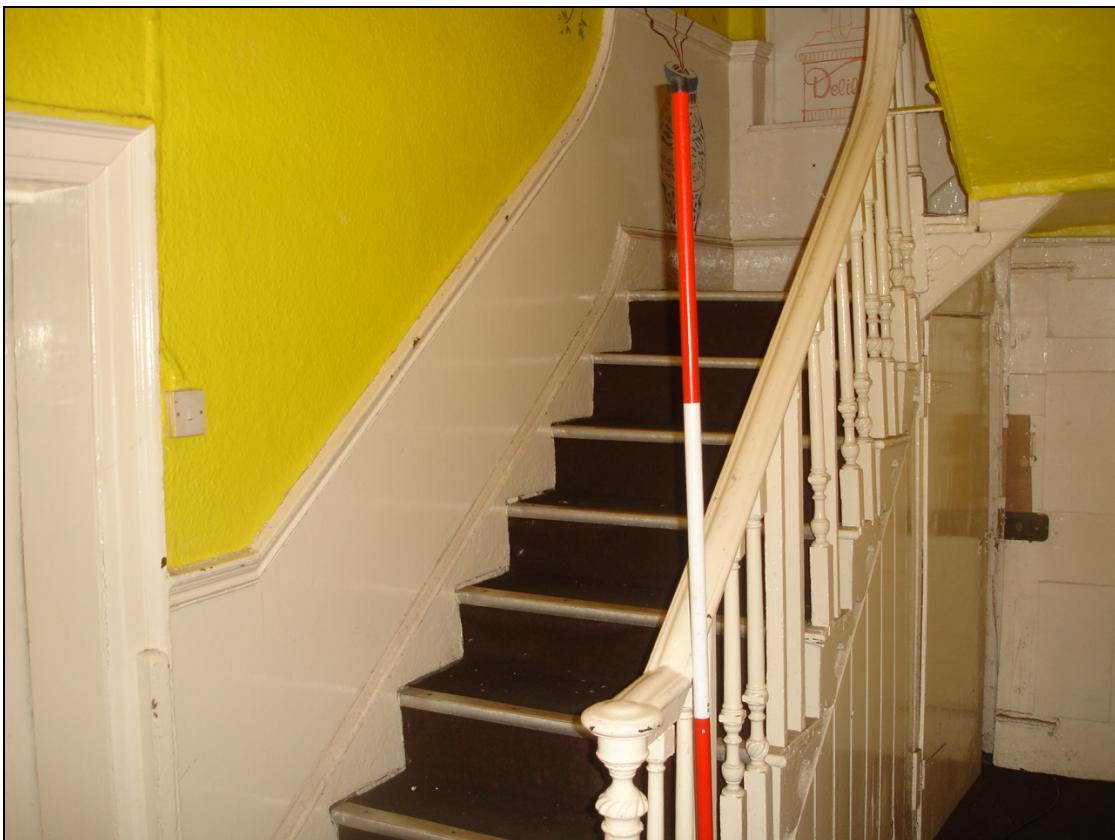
General view of staircase, showing hand and wall panels, looking SE.
